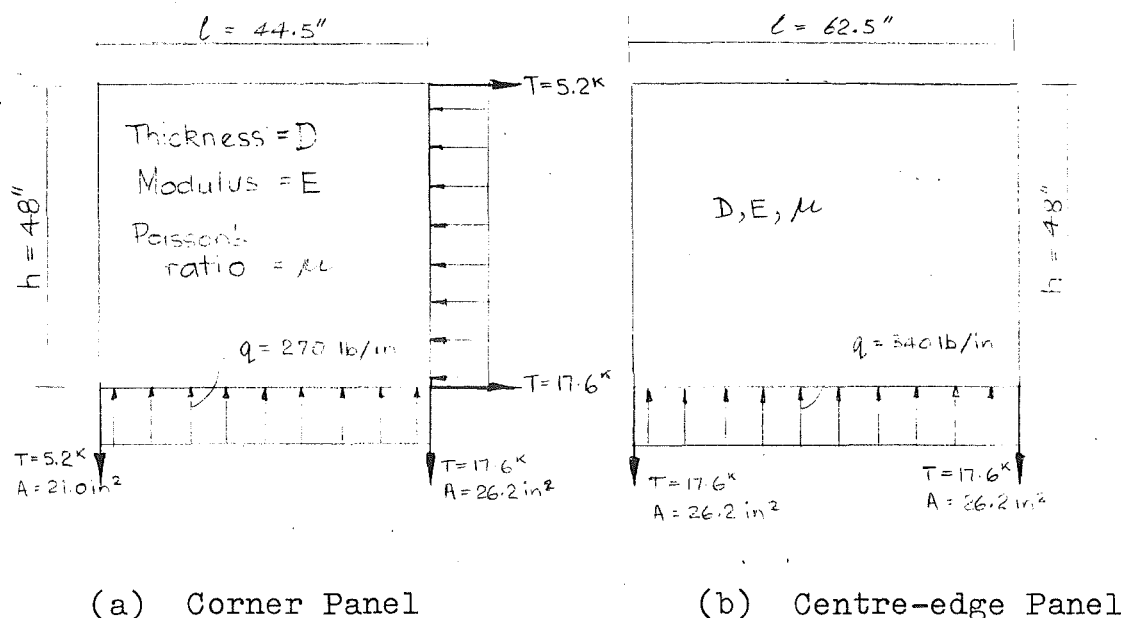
SURROUNDING PANELS AS DEEP BEAMS
